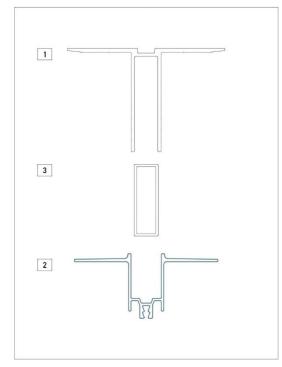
Components for the connection of the vertical profile to the façade [drawing created using AutoCAD]
